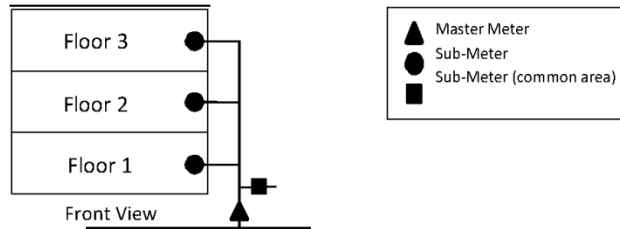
Sub-metering Configuration for Apartment Buildings
